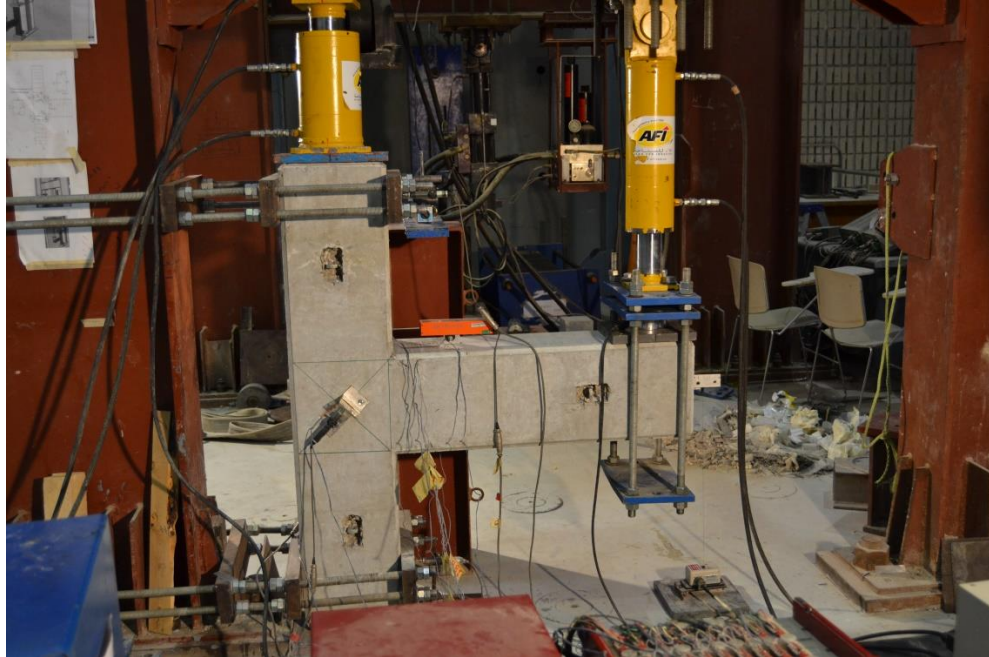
28: Hydraulic jacks (A) & (B) used to test BCJ specimens
